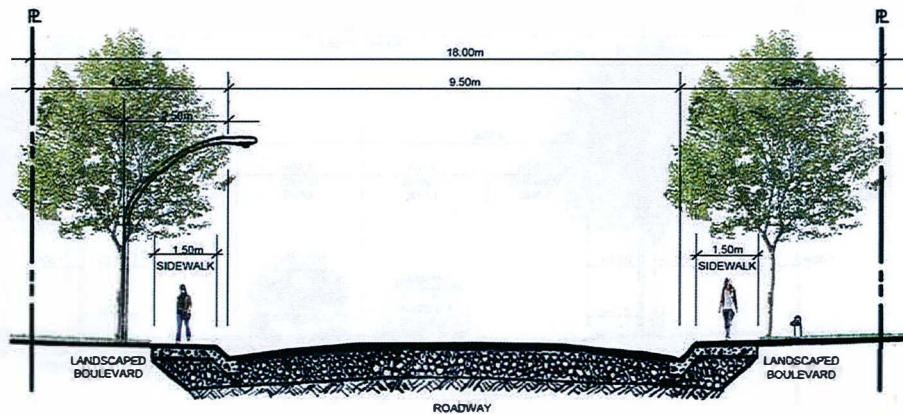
Residential Local Road (Front Driveway Access) Cross Section
